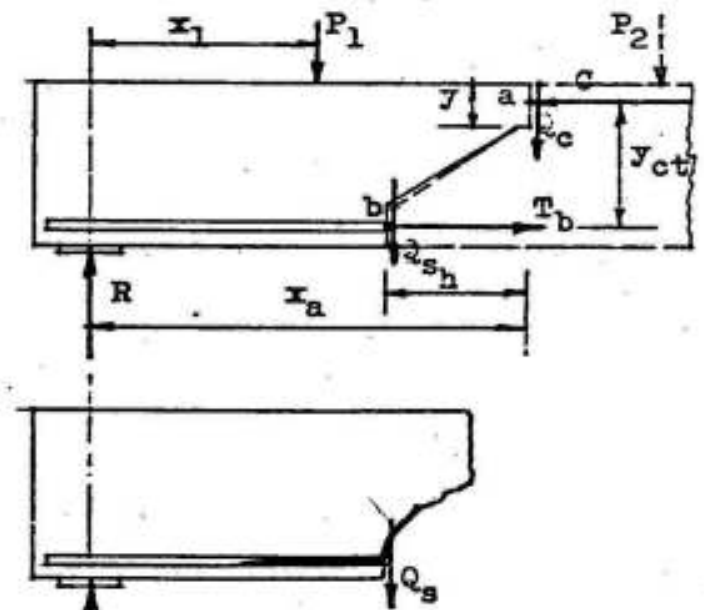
Forces at diagonal crack in beam without web reinforcement
